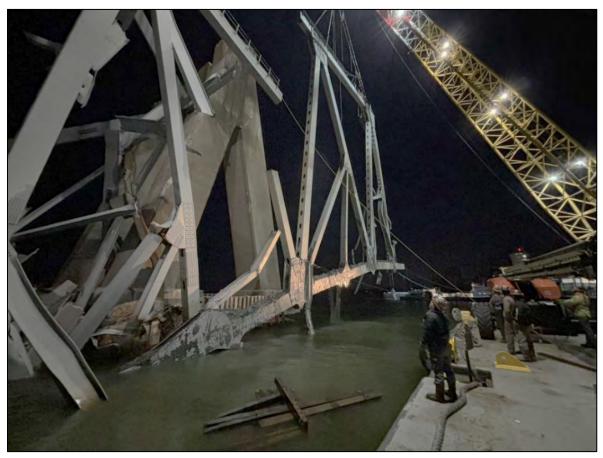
Truss section 0-B being pulled from the water at about 0130 on 23 April.
